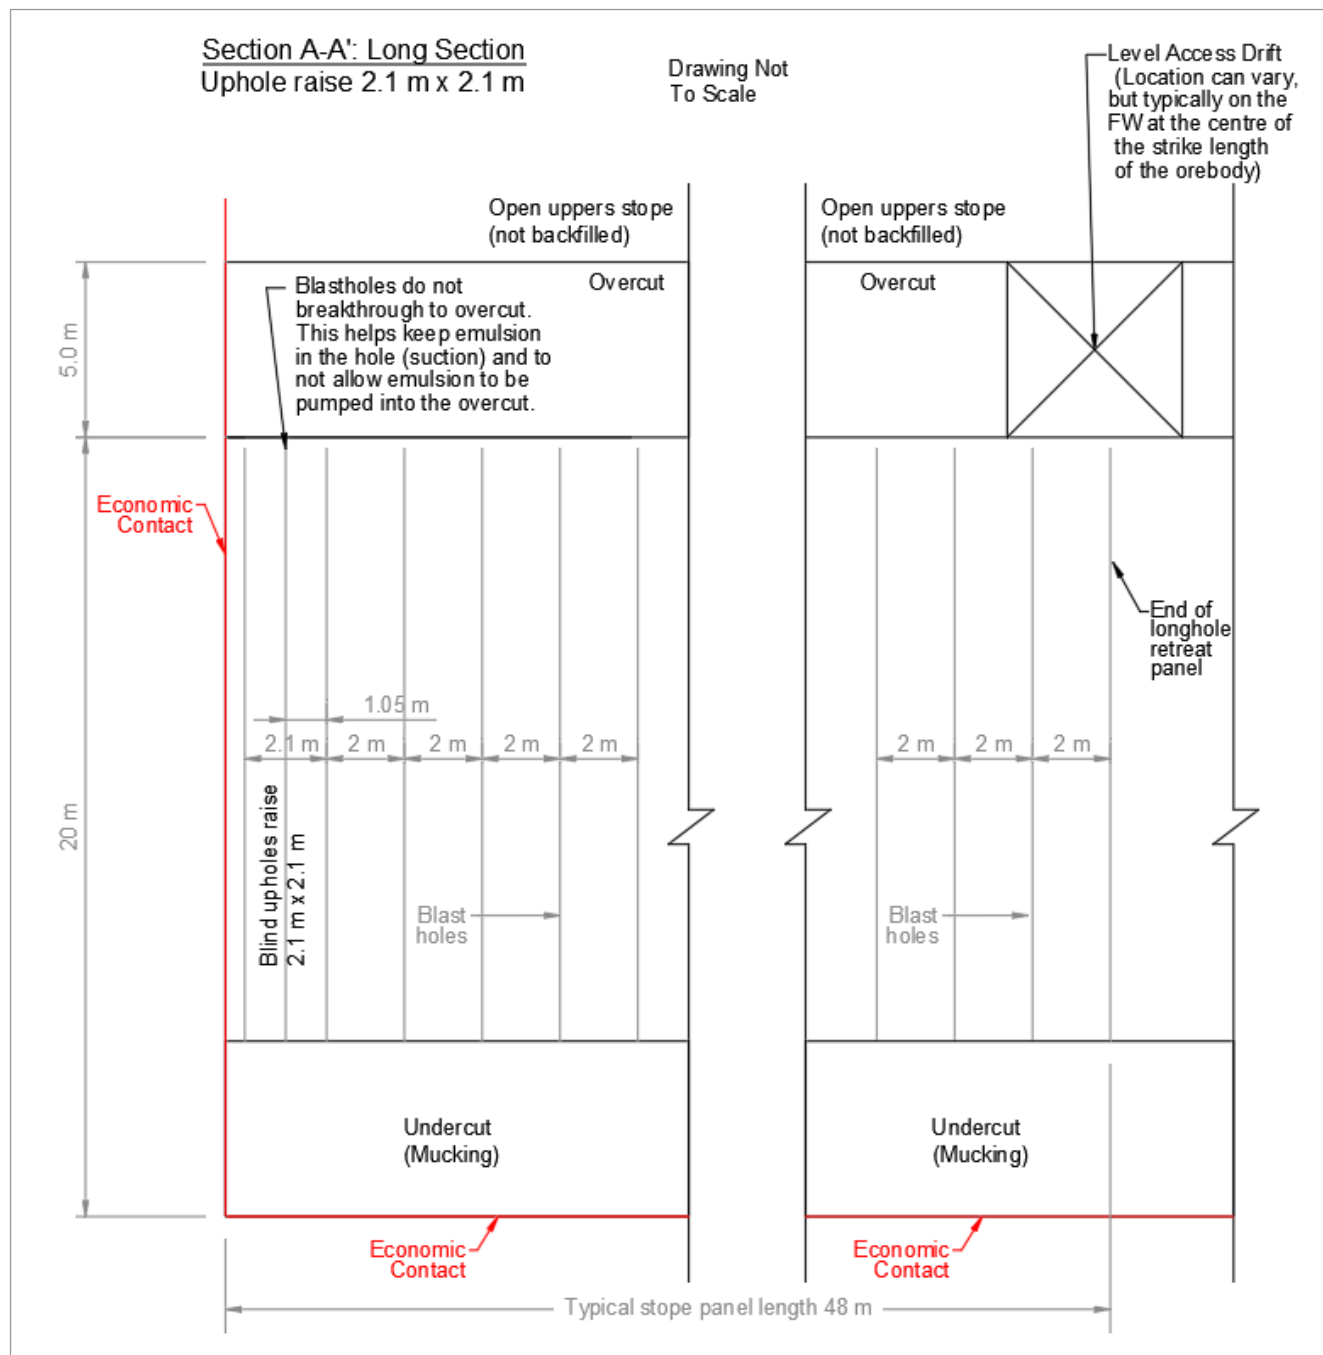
, Figure 16.17, and Figure 16.18 respectively, illustrate a typical plan view, longitudinal section, and cross section of an uphole stope of 20 m height (floor to floor), fixed width of 7.5 m and length of 48 m. Uphole stopes account for approximately 68% of the planned stope tonnage for the underground mine. The remaining 32% of planned stope tonnage will be from downhole stopes.
